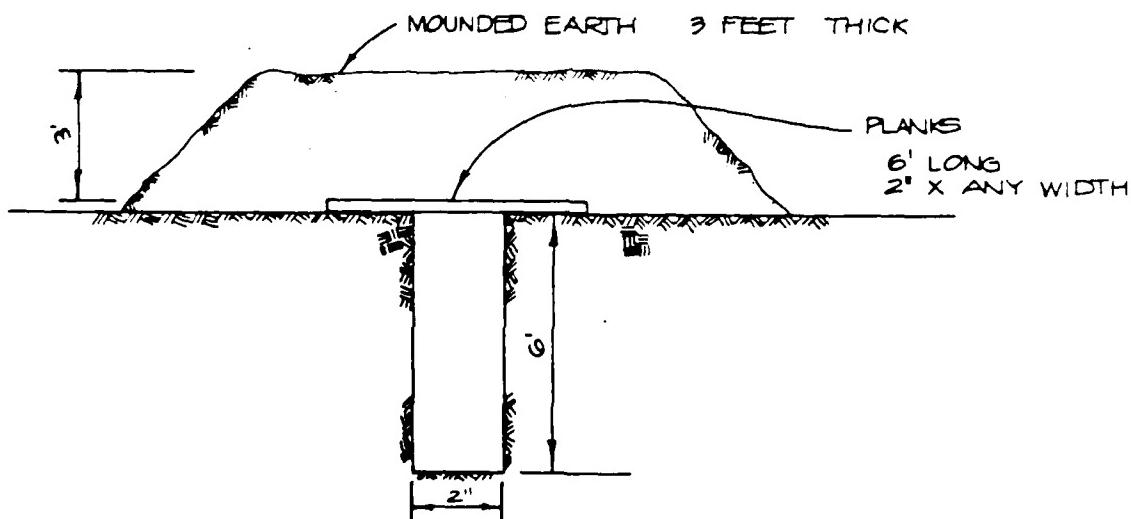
describes a typical trench shelter. Implementation requires only mechanical excavation equipment, sufficient planks or other resources for support of the mounded earth, and soil strata that will stand vertical to a depth of 6 feet with no ground water at that excavation depth.
